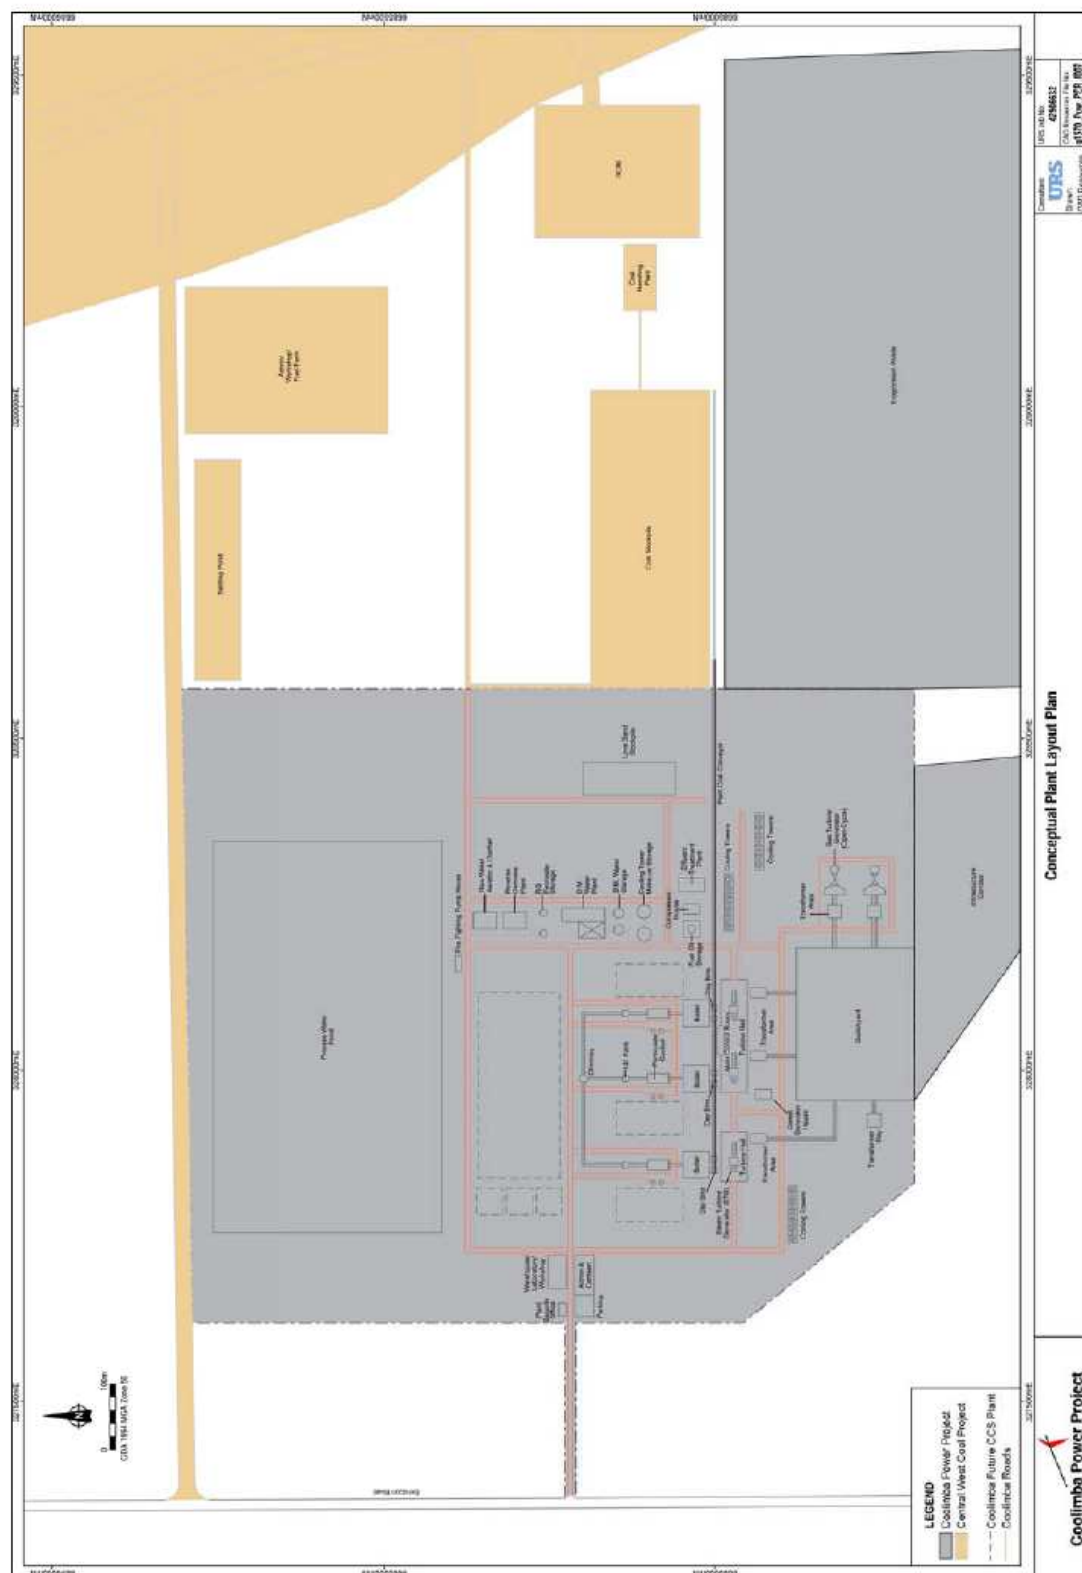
Conceptual power station plant layout plan (Source: Figure 1-4 from URS Australia Pty Ltd, 2009)
